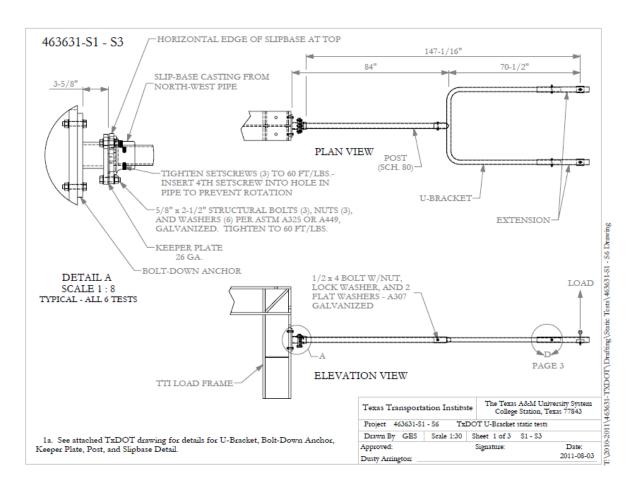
U-Bracket Installation Static Test Setup Drawings.
